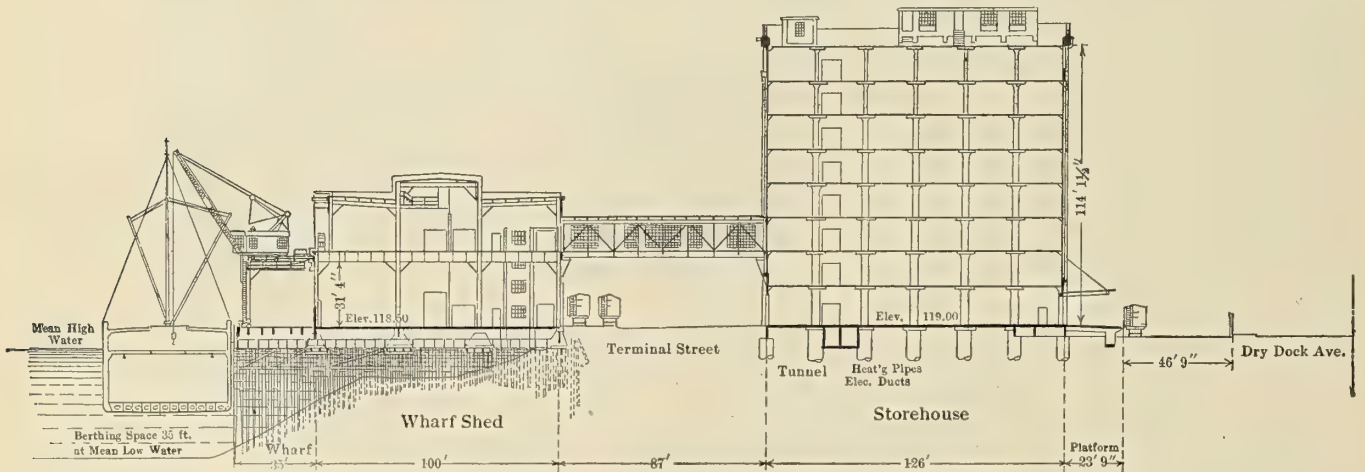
Cross Section of Storehouse and Wharf Shed, Boston Army Supply Base
